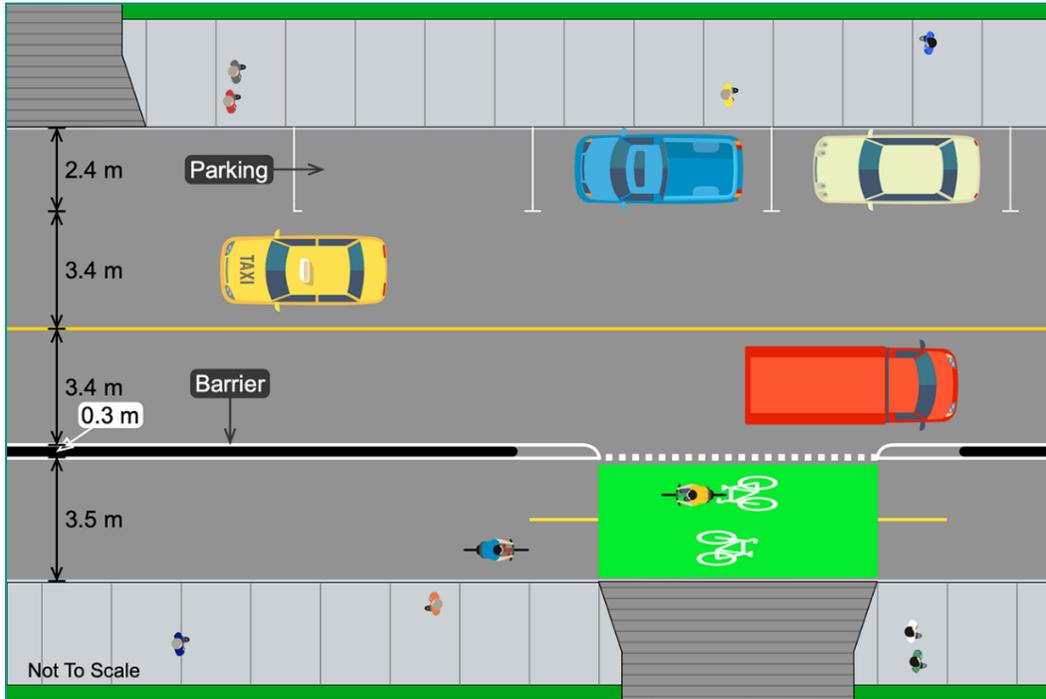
Front Street Cycle Track, Typical Cross-Section For 14.5 M Pavement Width
